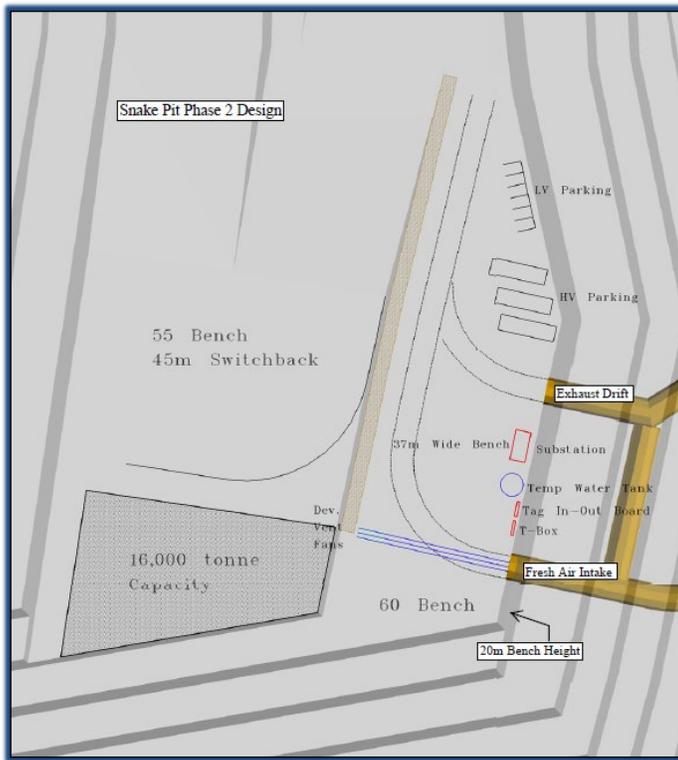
shows the layout of the planned facilities outside the production portal.
